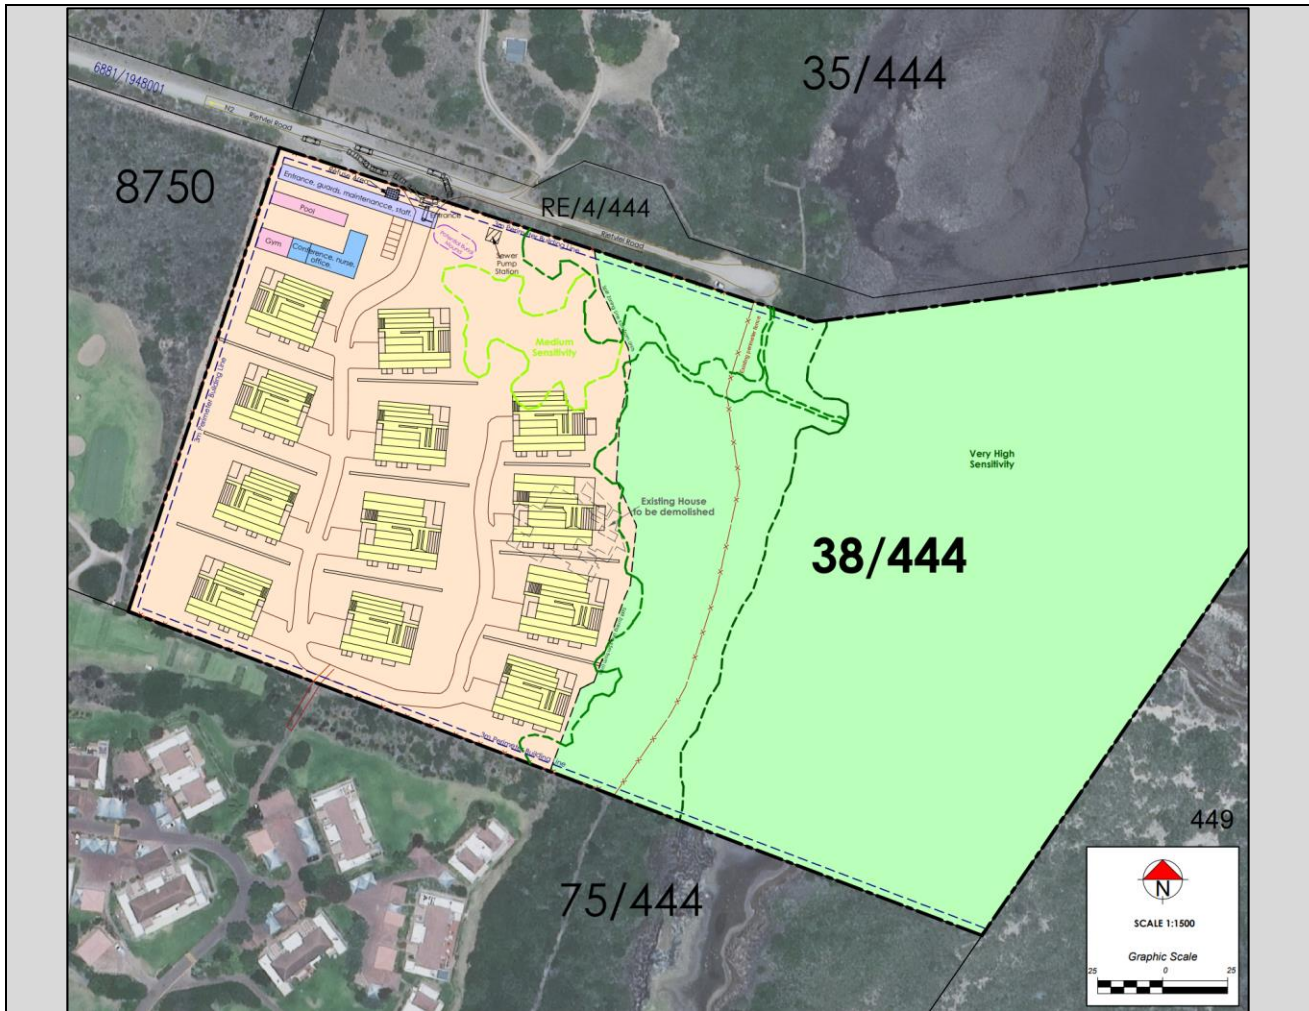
Proposed site development plan (Marika Vreken Urban & Environmental Planners, 2023).
